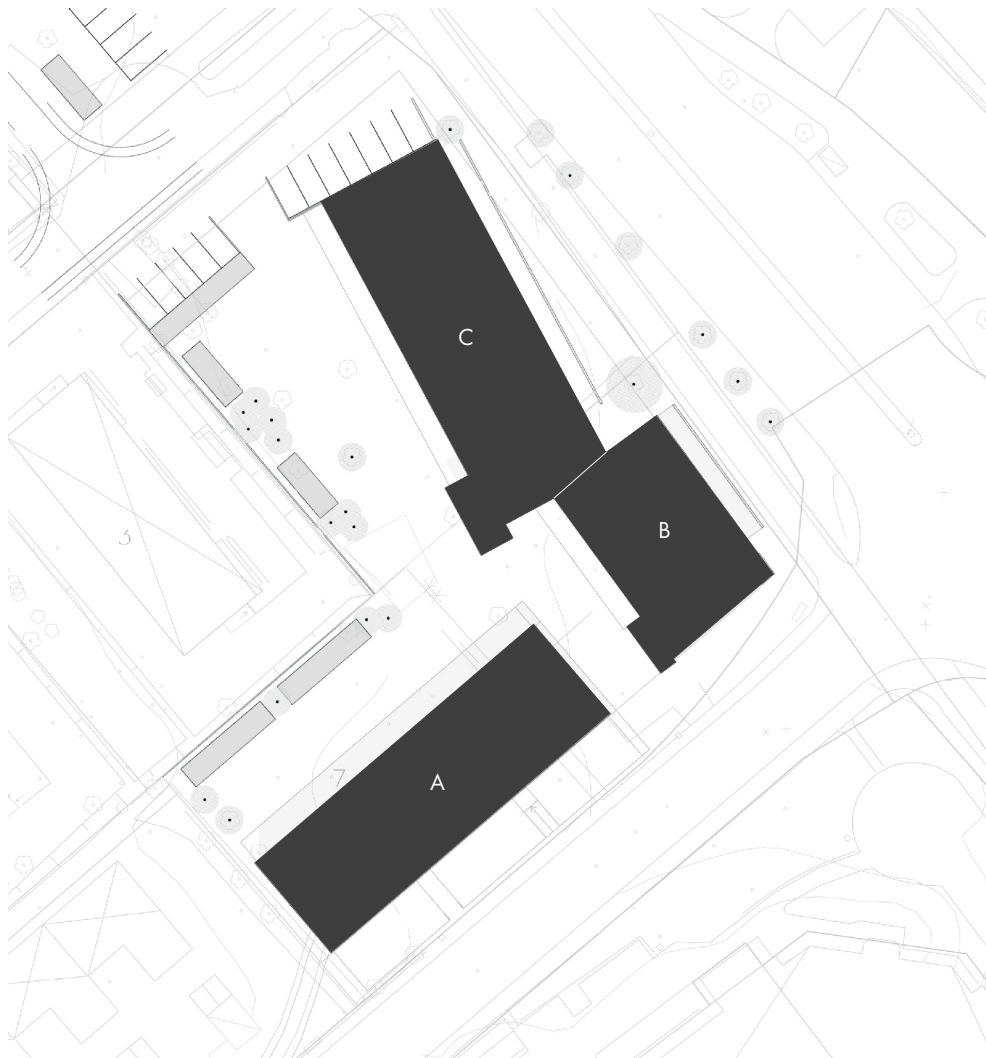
Situation plan, scale 1:500 with building index (Drawing credit: AIX Arkitekter).
